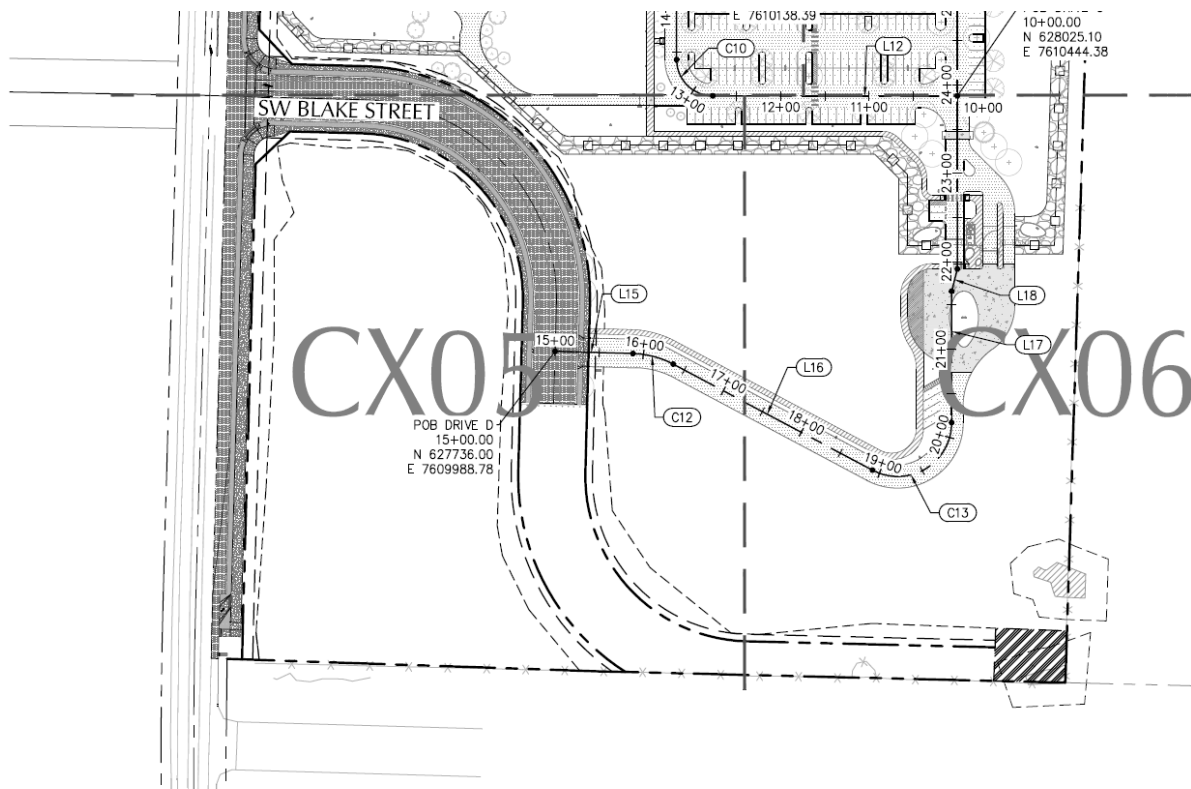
Substation Siting Options (Source: IOC (AR 19-0005) – Civil Site Plan)
